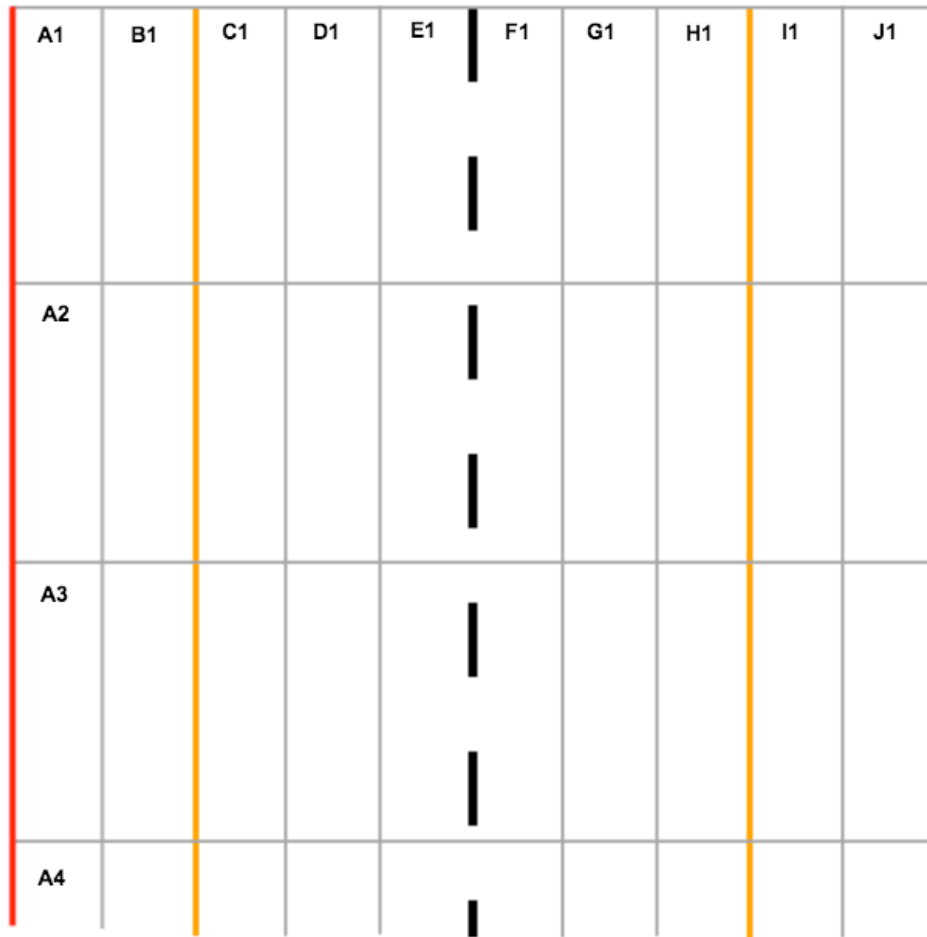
A sectioning of the road surface to execute both a cross-section and a longitudinal test. This testing grid is 30 feet (3X10) by 200 feet (20X10) – only 3.5 of the longitudinal sections are shown.
